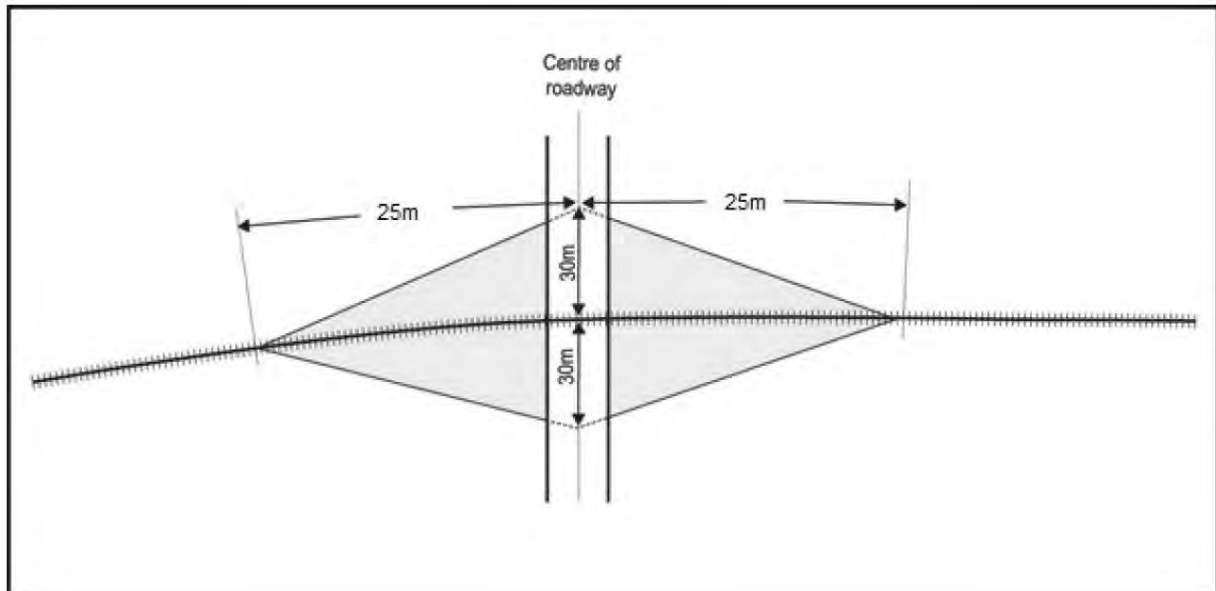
Approach sight triangles for public road/rail siding level crossings.
